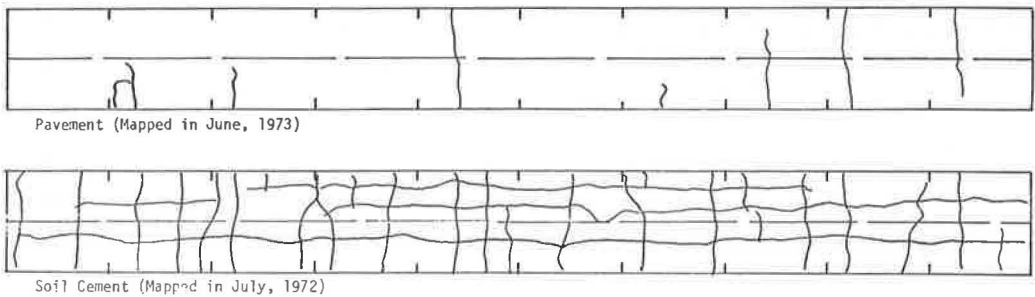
Cracking pattern of soil-cement base and superimposed pavement with artificial traffic.
